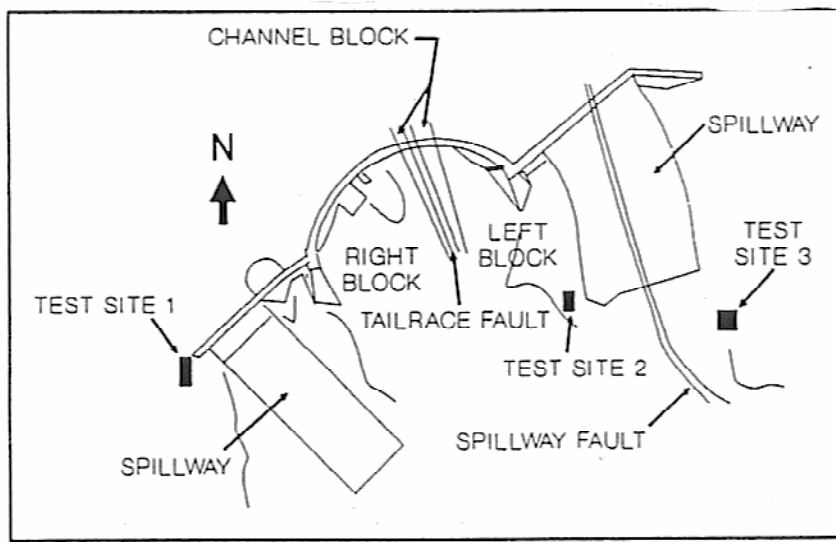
Simplified plan of Stewart Mountain Dam, AZ.
